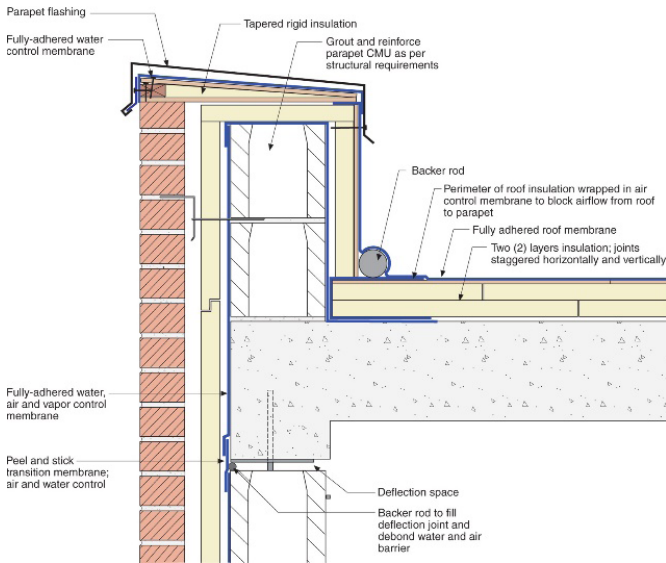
The Masonry Parapet: The thing to note here is that the concrete deck itself is the air control layer and so an additional one is not necessary. However, joints in the concrete deck need to be addressed for air control layer continuity.
